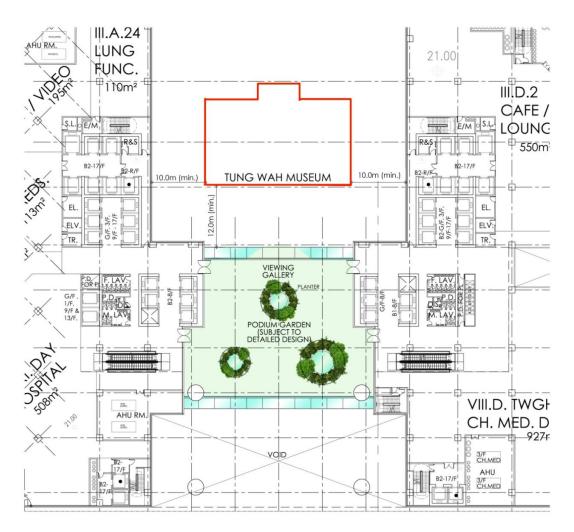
Third Floor Plan (Podium Roof Garden provides a viewing gallery overlooking the Museum)
